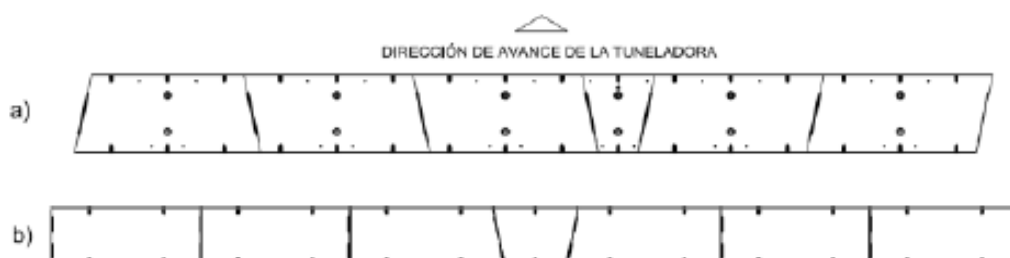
Precast segment shape. a) Trapezoidal shape b) Rectangular shape
